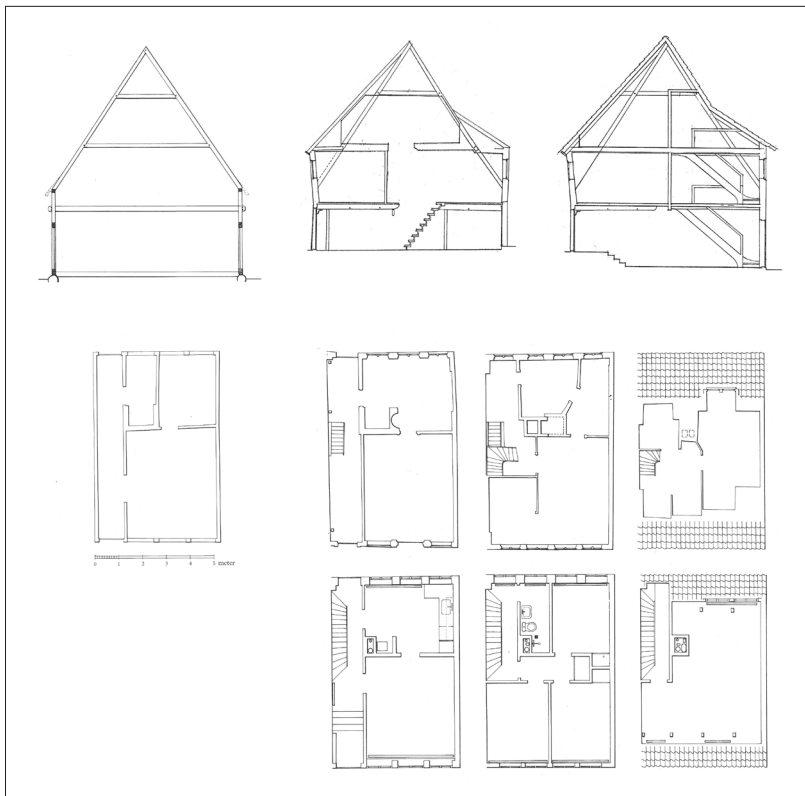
Sections and layouts of Sankt Annæ Gade 14, scale circa 1:200.
